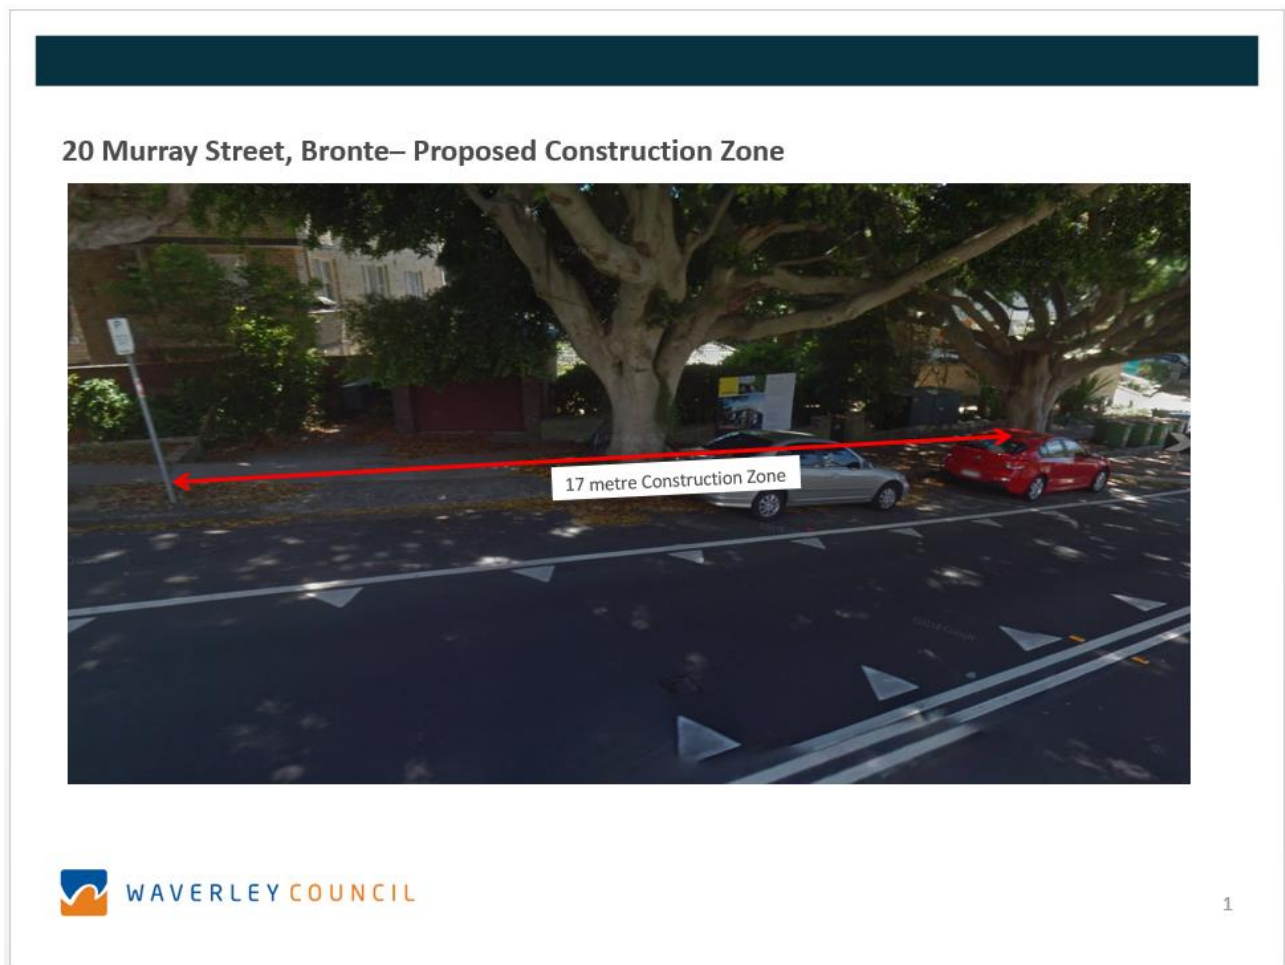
Proposed construction zone at 20 Murray Street, Bronte.
